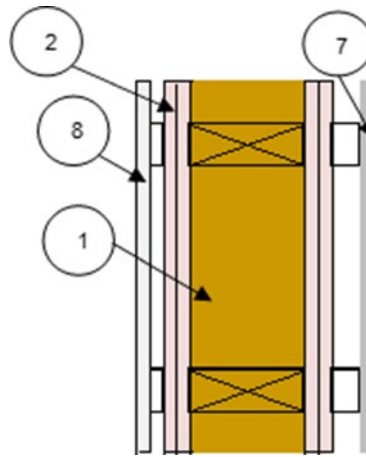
External timber framed wall with non-fire grade lining and cladding – Section view
